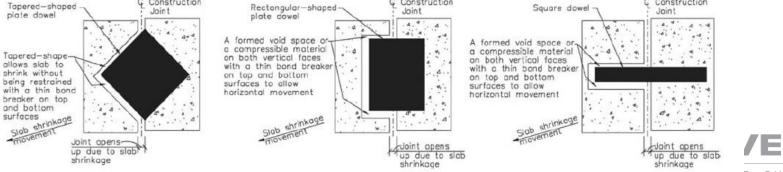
Plan view indicating provisions for longitudinal movement at doweled construction joints.
